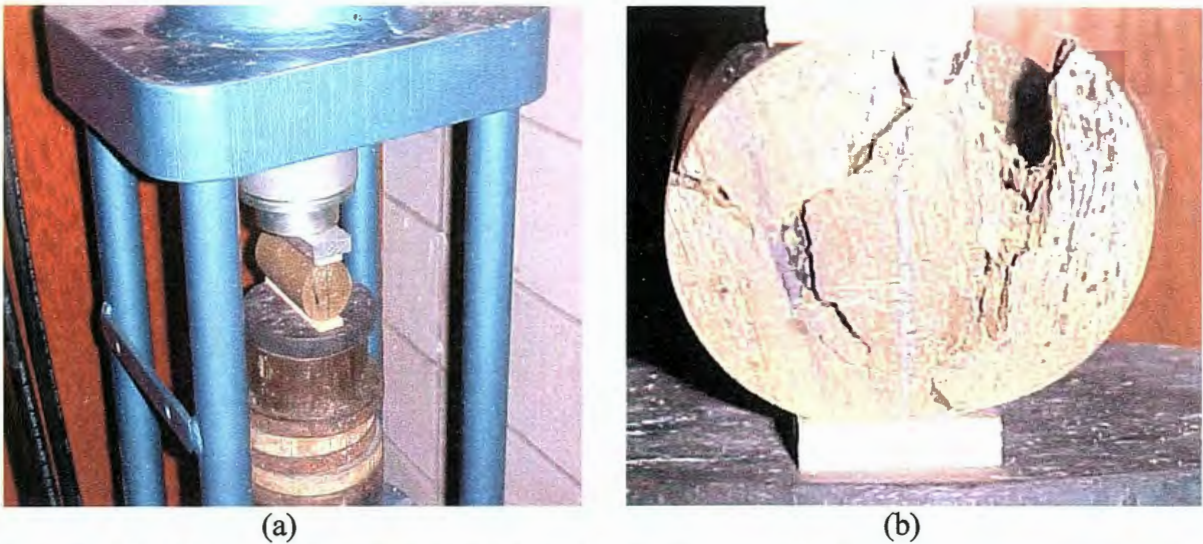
(a) Splitting tension test setup, (b) specimen failing
